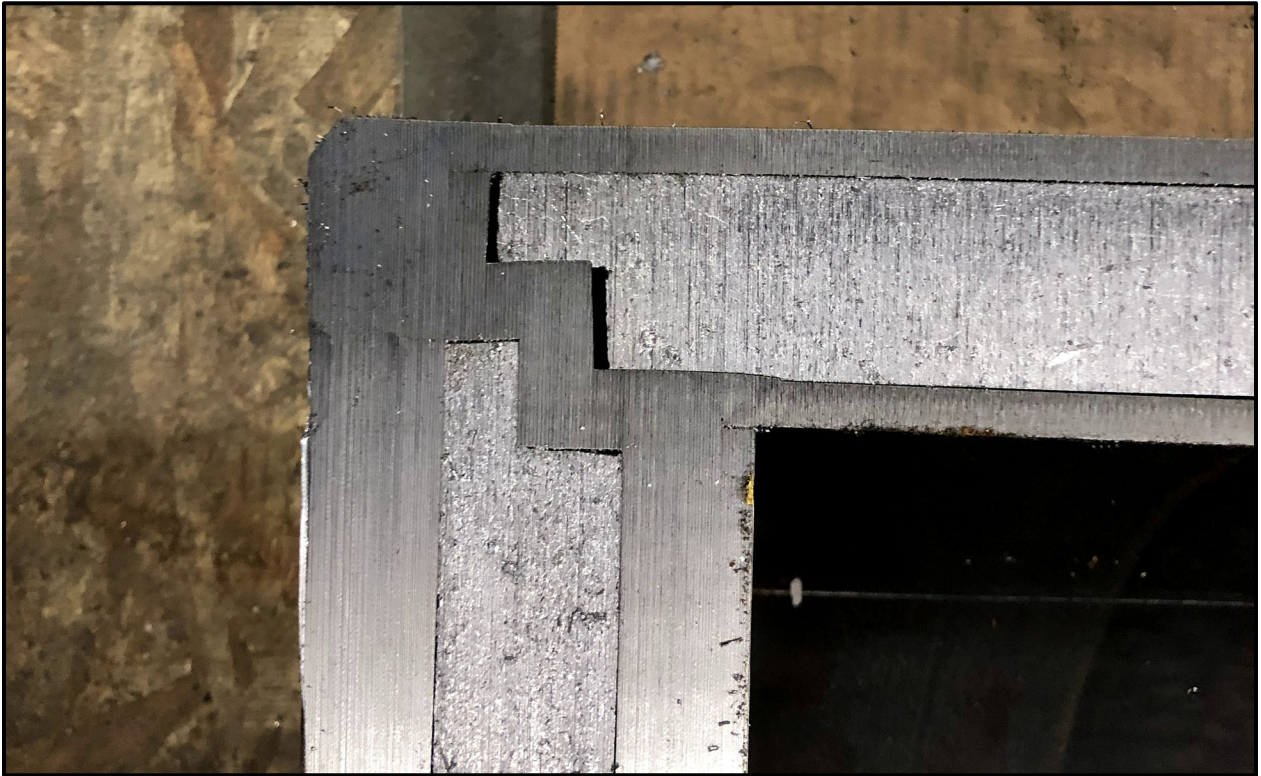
SC-30G2 18TU-02 Destructive Disassembly Cut AT/AU at Lower Flange
